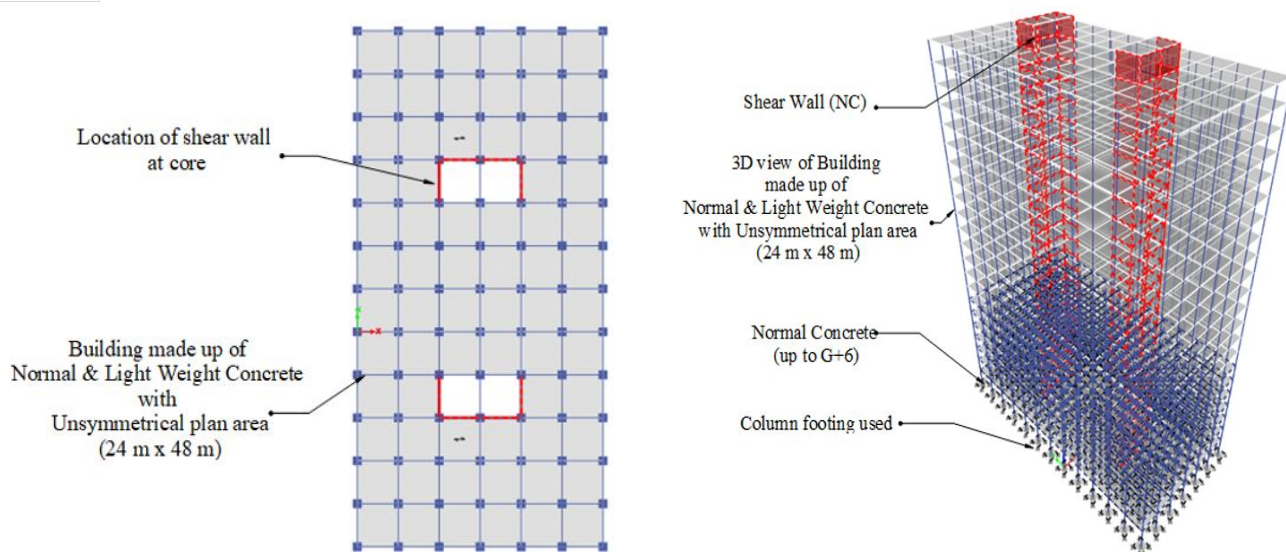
Plan and 3D view of unsymmetrical plan using Normal and Light Weight Concrete (NAL2)
